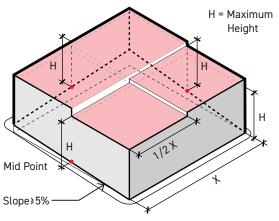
BUILDING HEIGHT ON SLOPE
